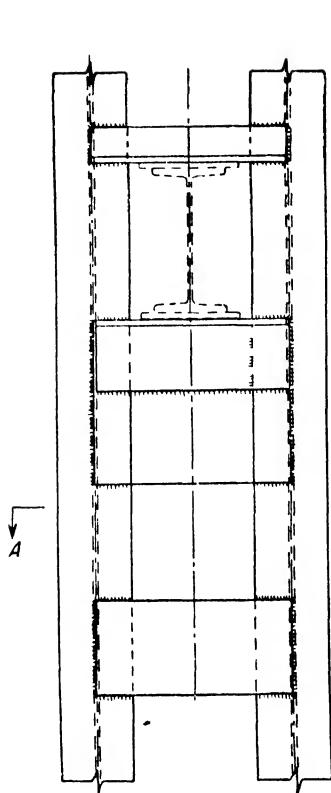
ALTERNATIVE METHOD OF ATTACHING FLANGE PLATES TO WIDE-FLANGE JOISTS
